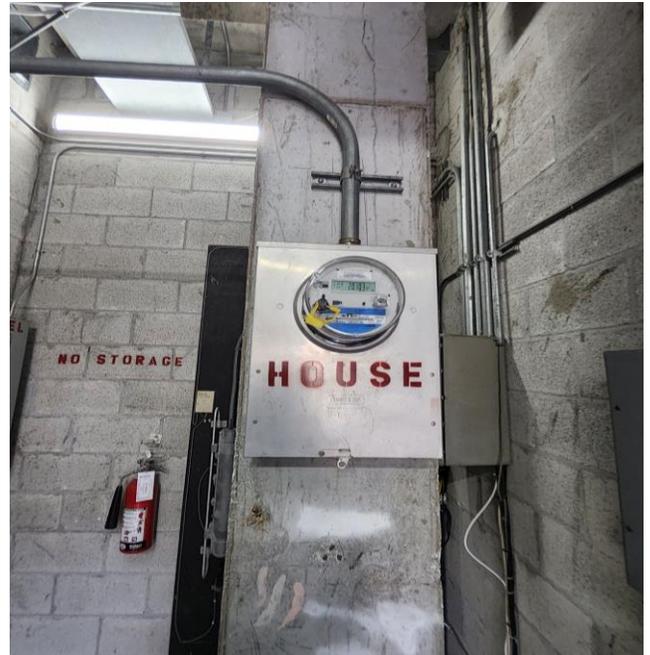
Item 4.1.b. Meter Electrical Room. Meter House.
